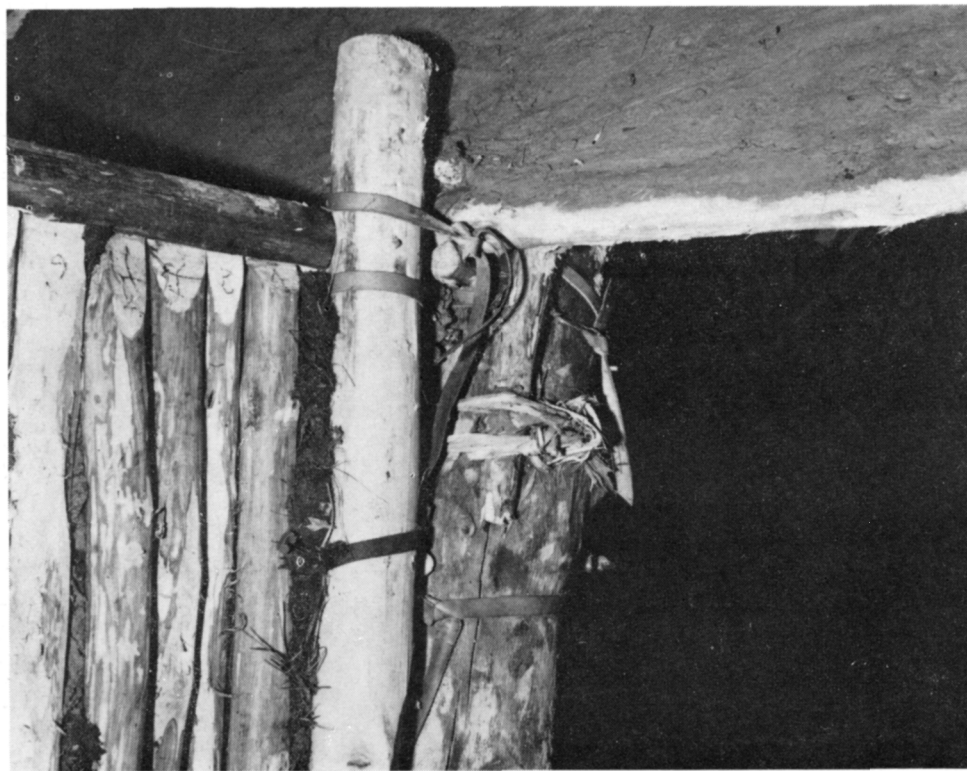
House No. 5. Ventilation aperture in the E gable; daubing of walls.
